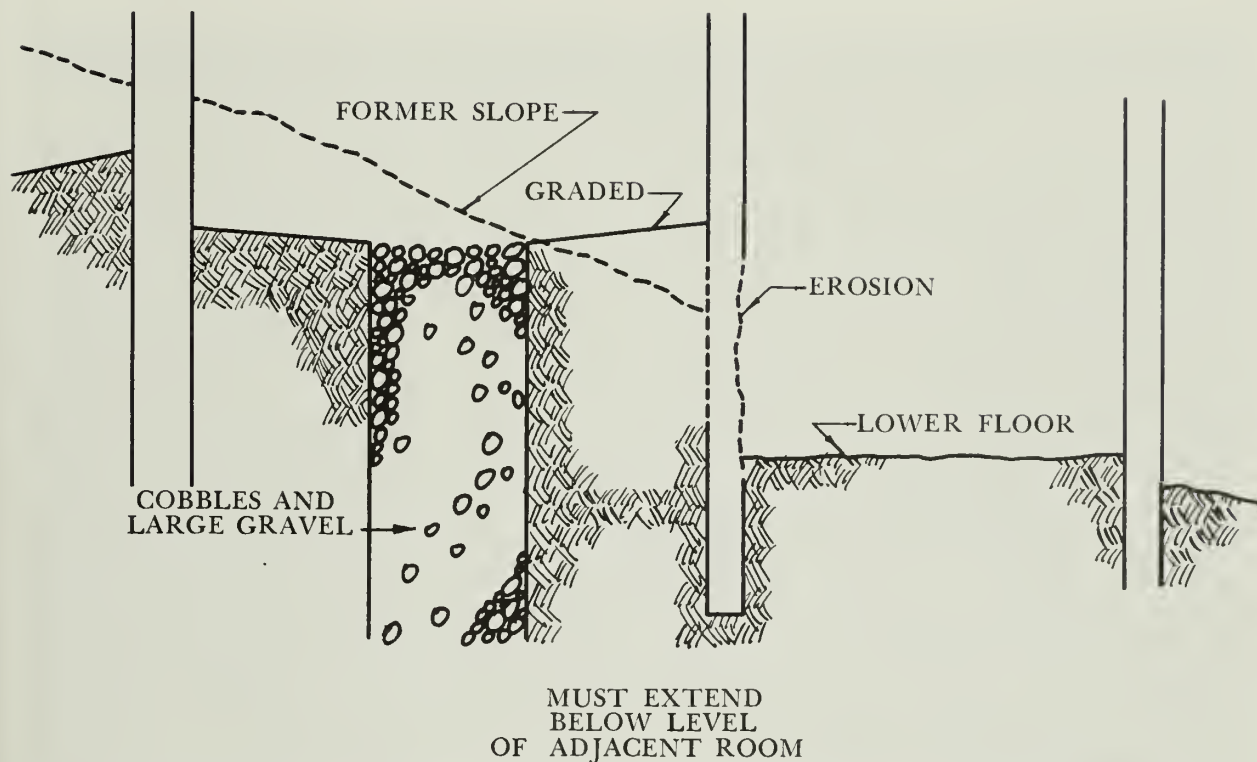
Construction of a dry-barrel (in section). Note that it has been carried well below the adjacent floor levels.
